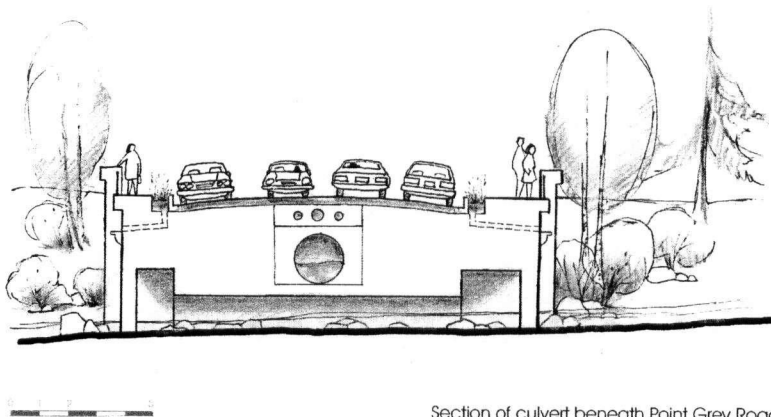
Showing the existing pipes beneath Pt. Grey Road
